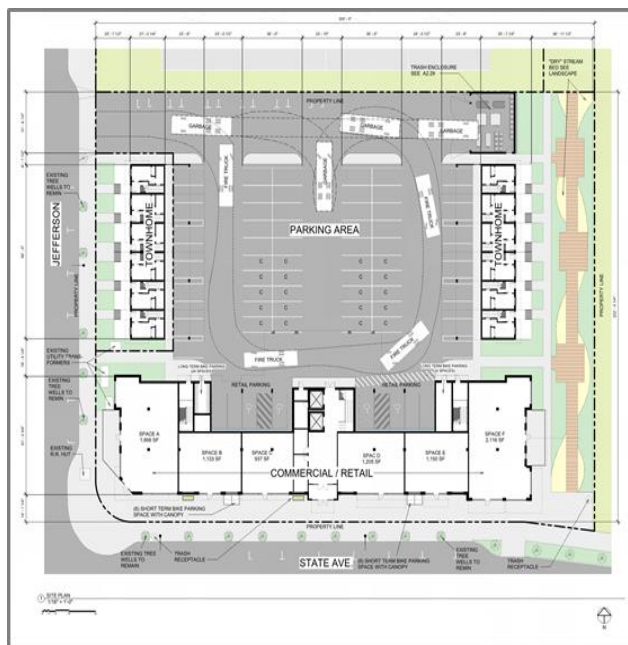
Site Plan-Project, Sheet A1.01. Westman Mill Concept Design Review. Attachment 2.
